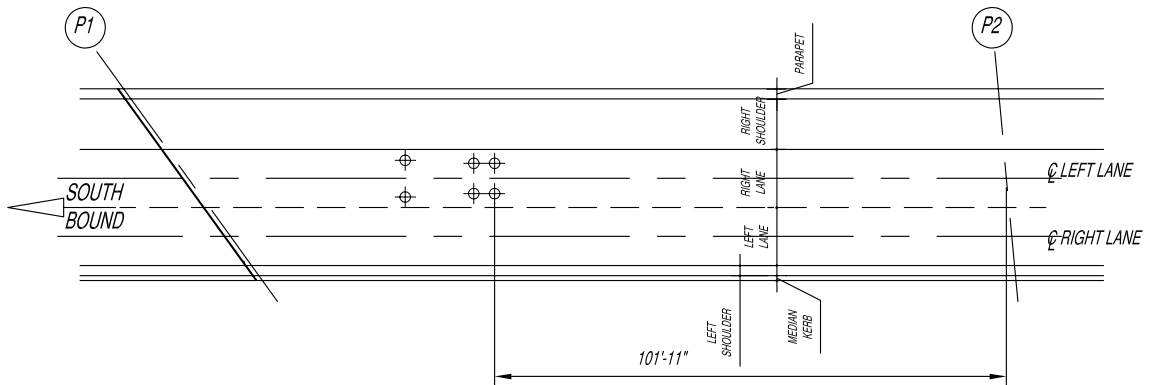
Wheel load disposition in Load Case 3 – controlled load test CRWL_1 right lane loaded
